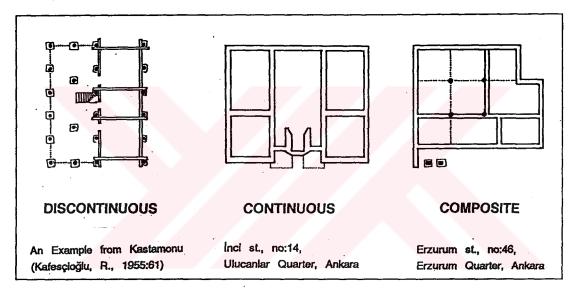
Schematic Drawing of Foundation Types in Timber Framed Structures
